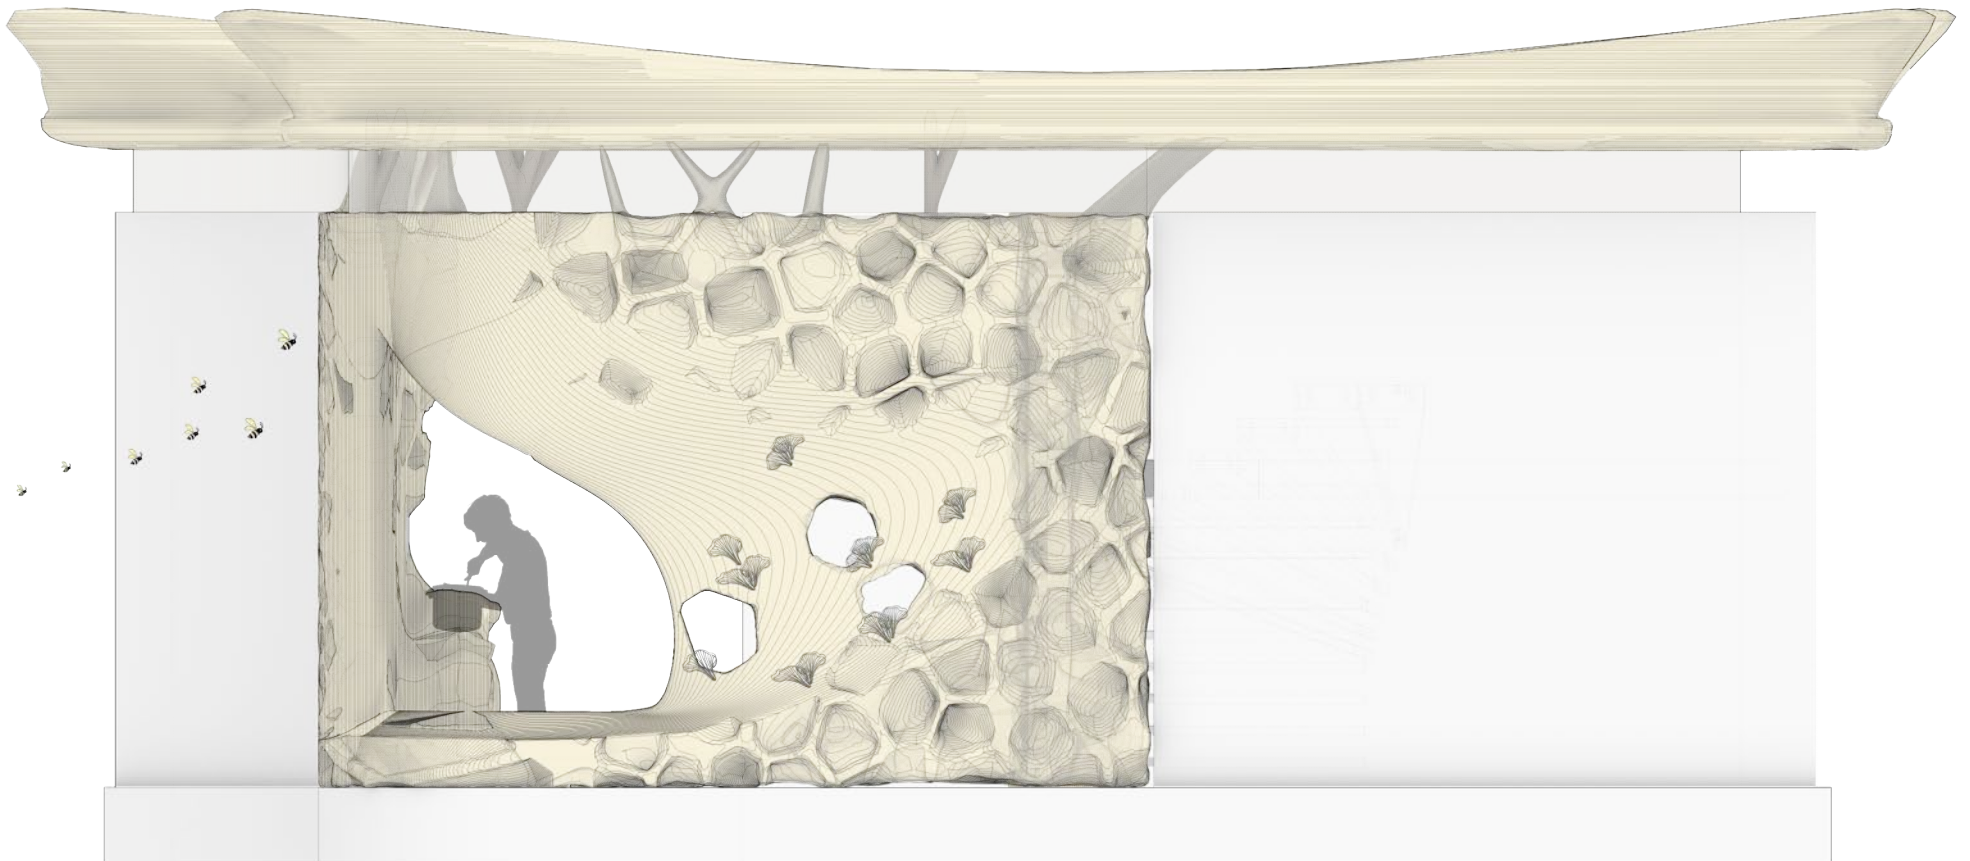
Exterior north elevation (1) - Scale 1 : 50
